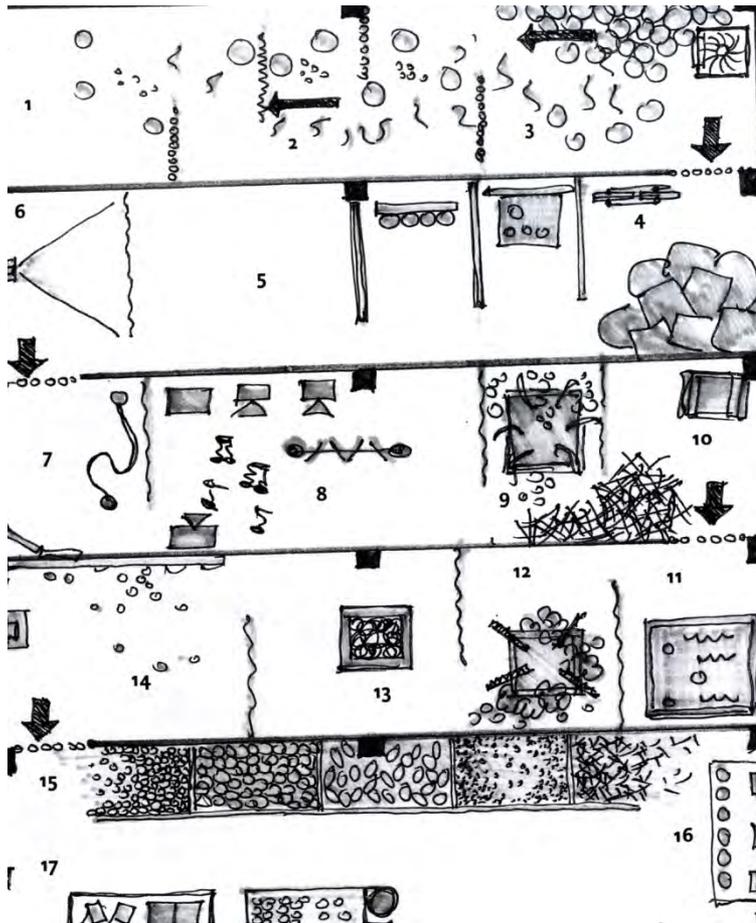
Floor plan: the first Snoezelen® room: the activities tent, 1978
